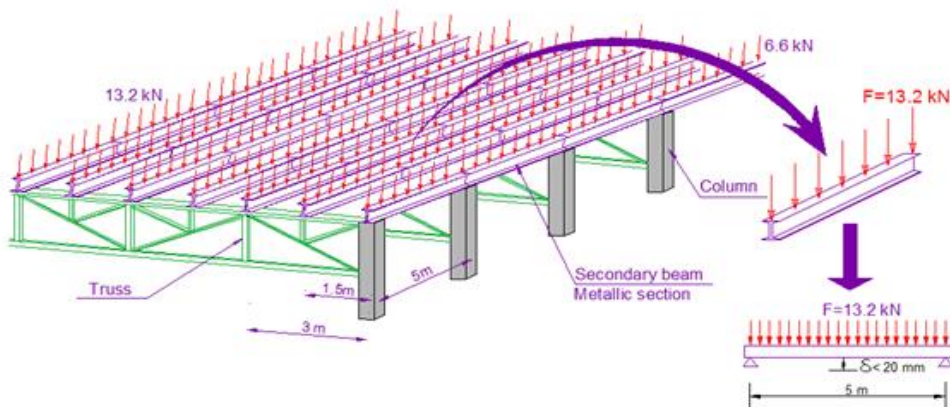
Schema of the roof metallic construction and the secondary beam separation
